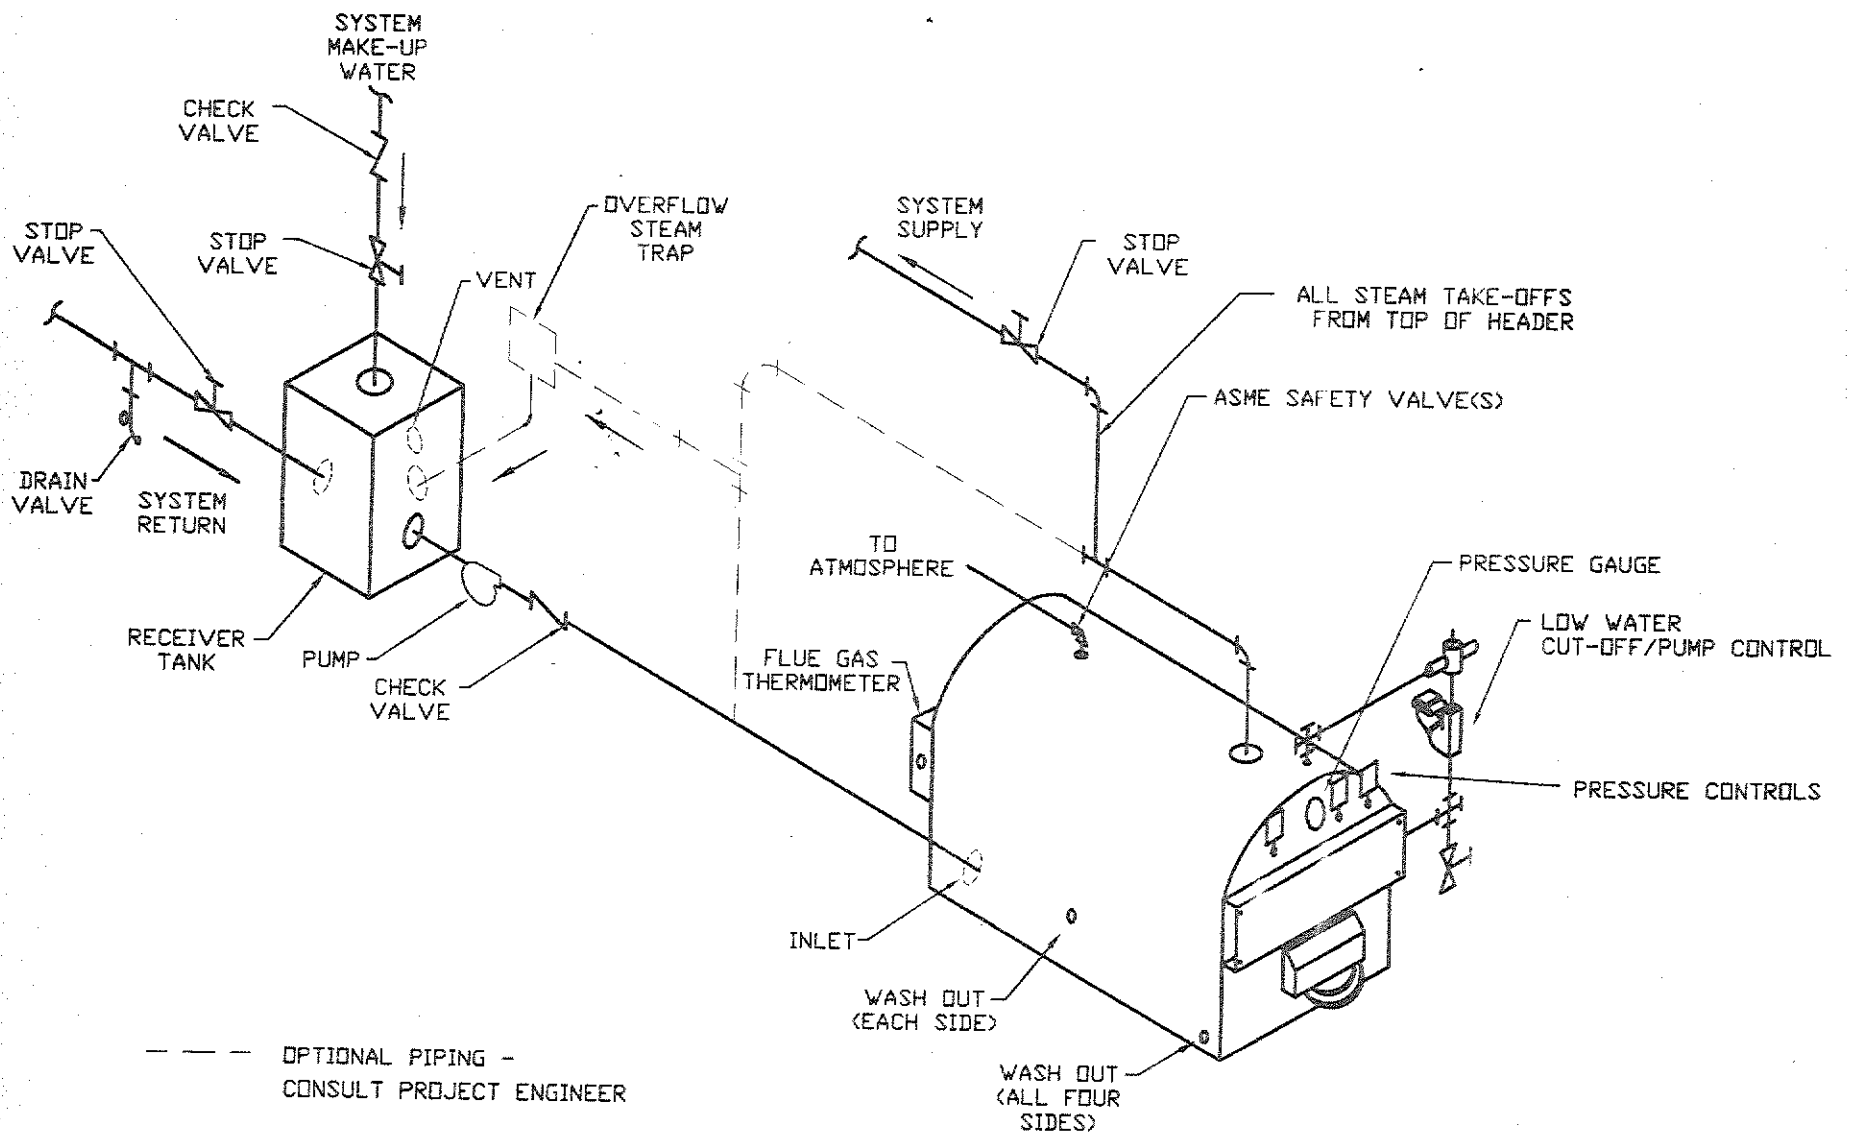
Typical Installation Piping for Single Low Pressure Steam Boiler
